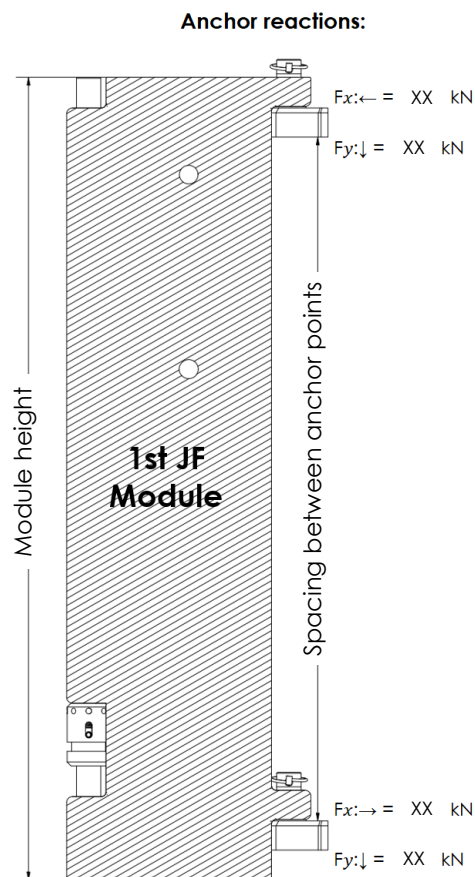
Example of configuration-dependent anchor reactions and required anchor spacing (as stated in the relevant datasheet).
